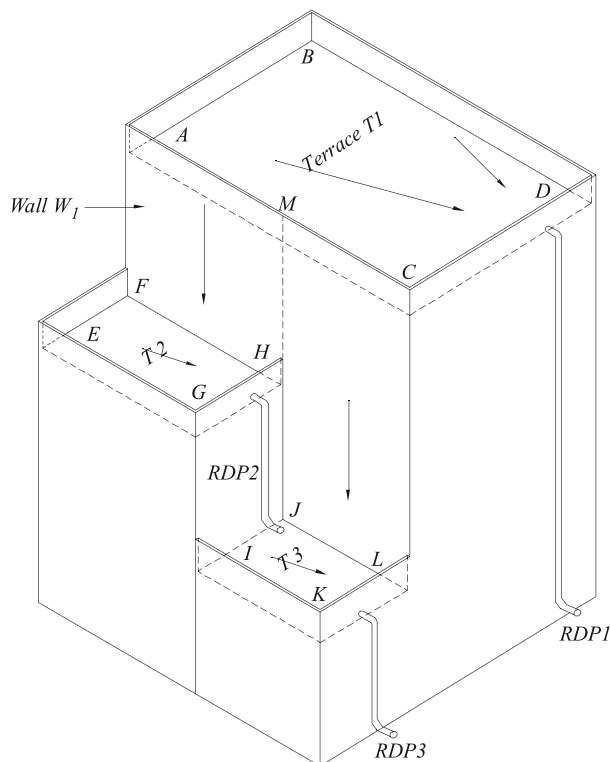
Catchment area of flat roof and surface wall. (Haq, 2006)
